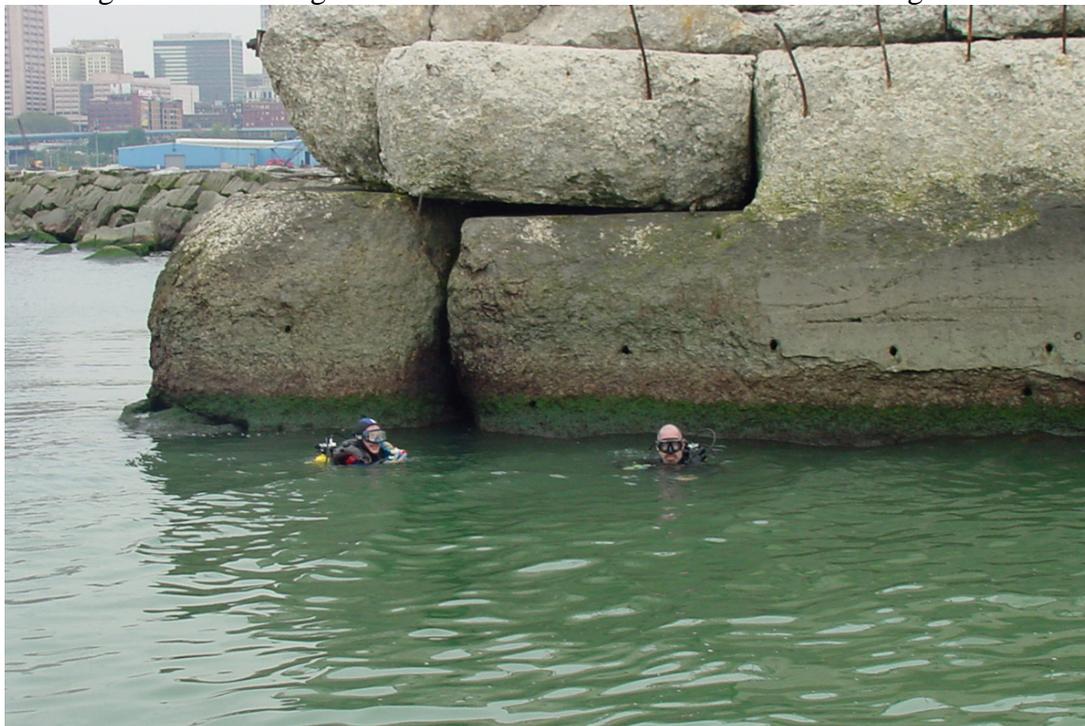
Divers surfacing at the northeast corner of the East Pierhead lightblock.
